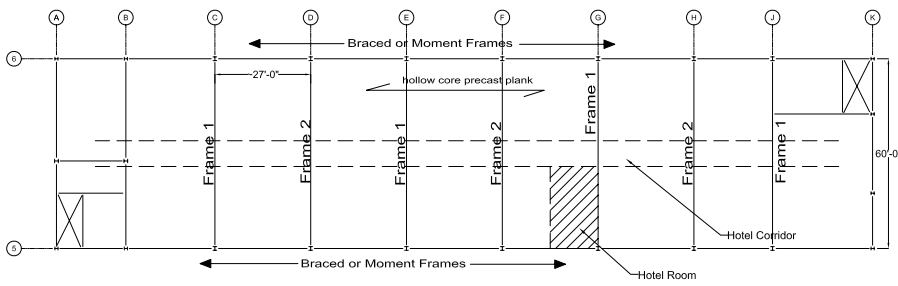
A typical staggered truss layout for the hotel portion of a mixed-use building.
